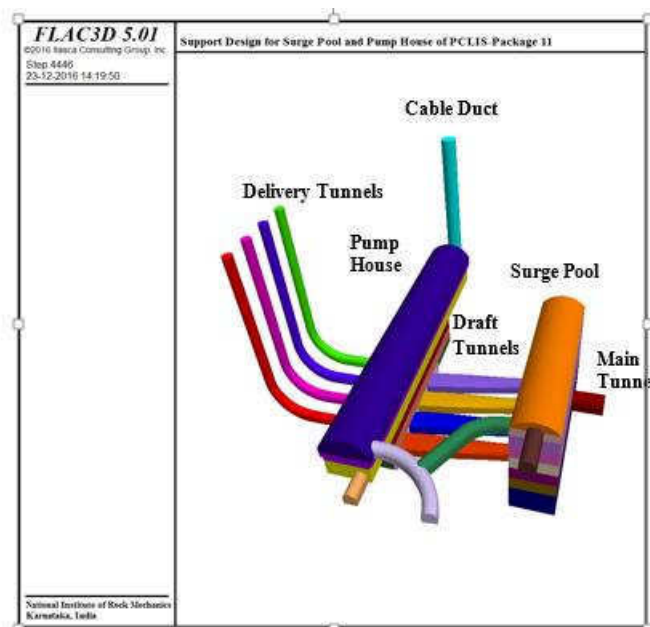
3D view of the model showing pump house, surge pool and other tunnels
